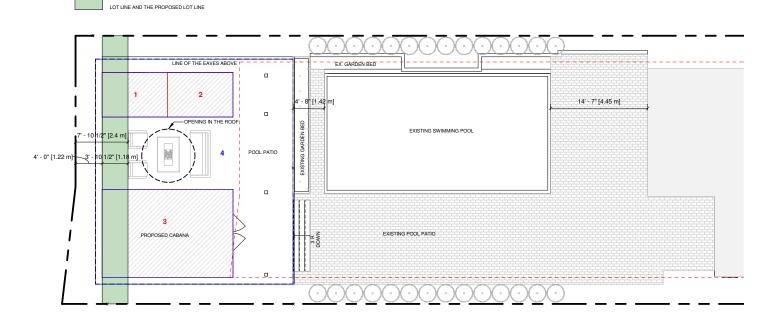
A- Proposed Site Plan With New Rear Yard Setback
